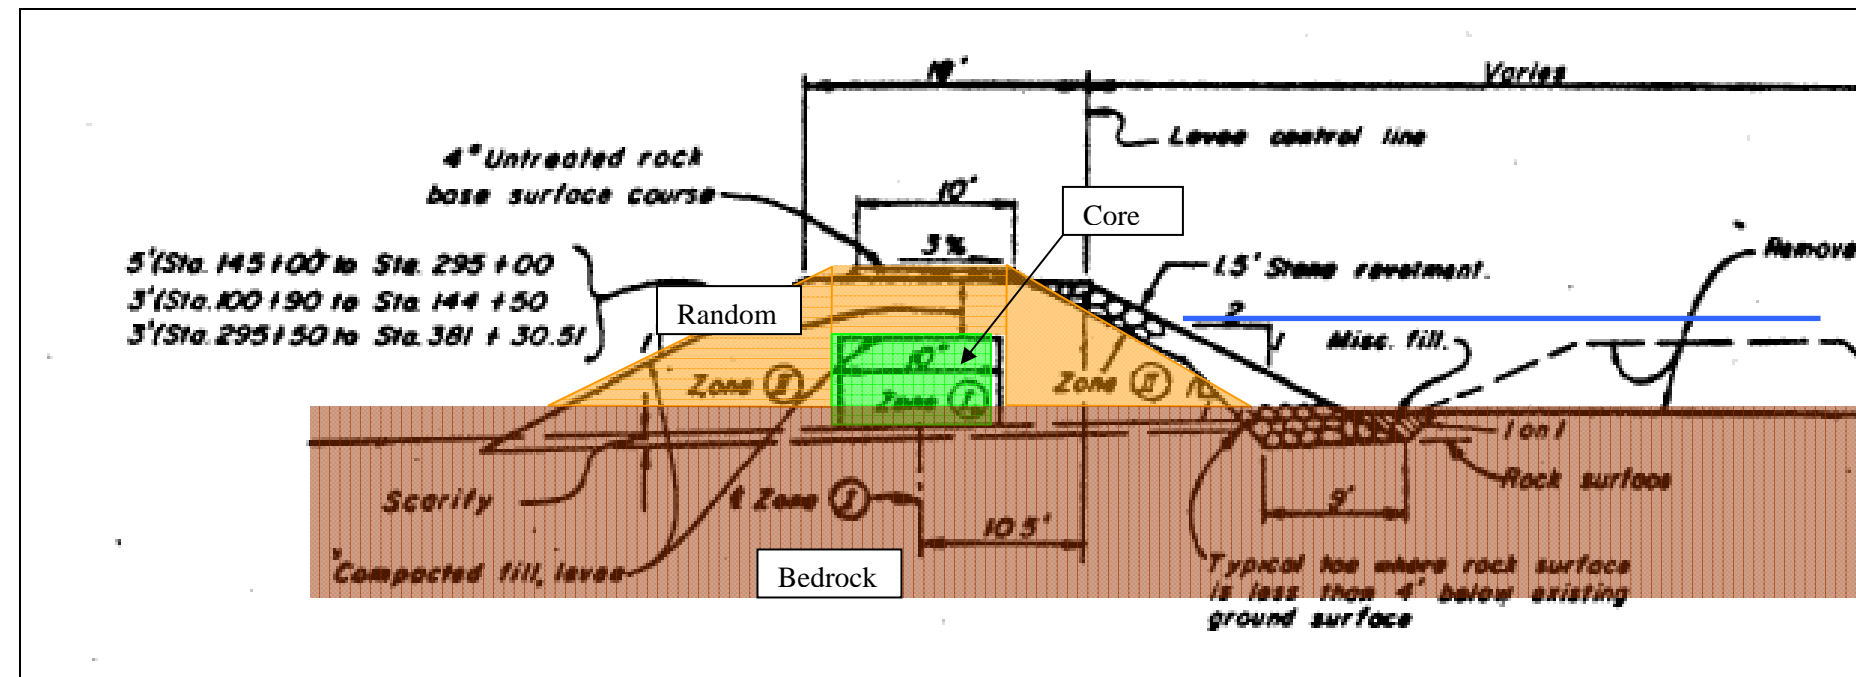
RWDL 495 Supported on Bedrock Foundation (RWDL Asbuilts, 1971)
